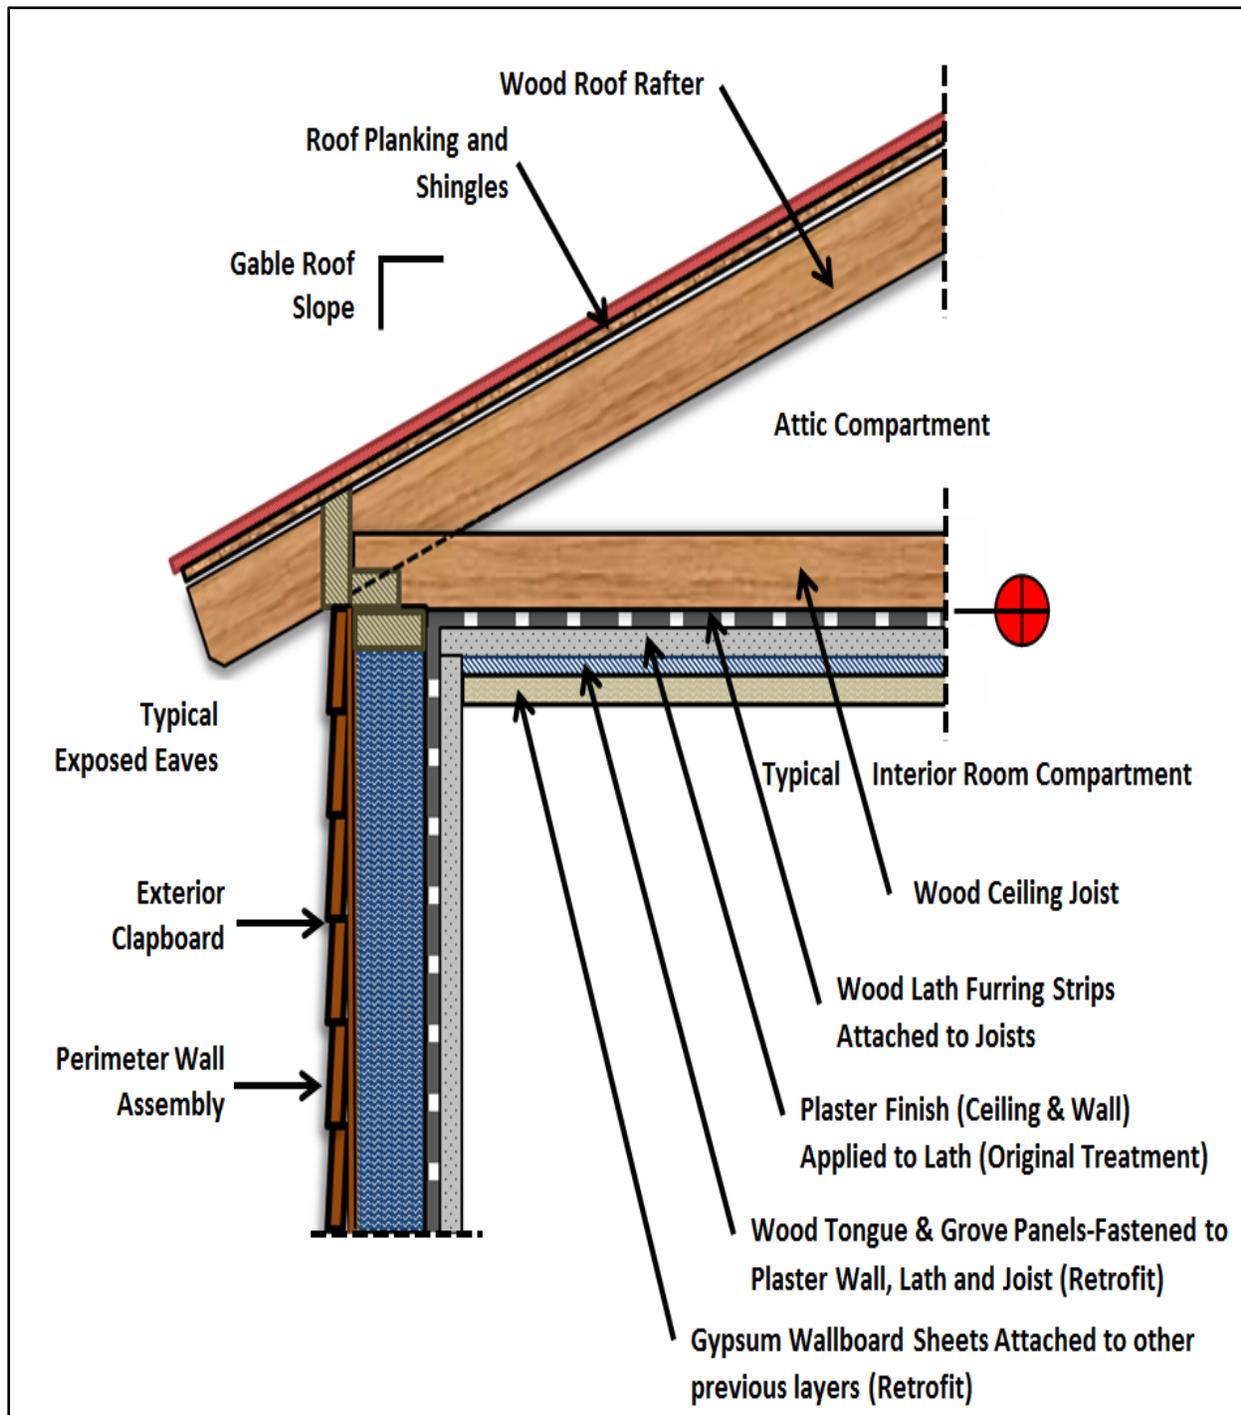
Typical Roof-Ceiling Assemblies with Ceiling Retrofits
